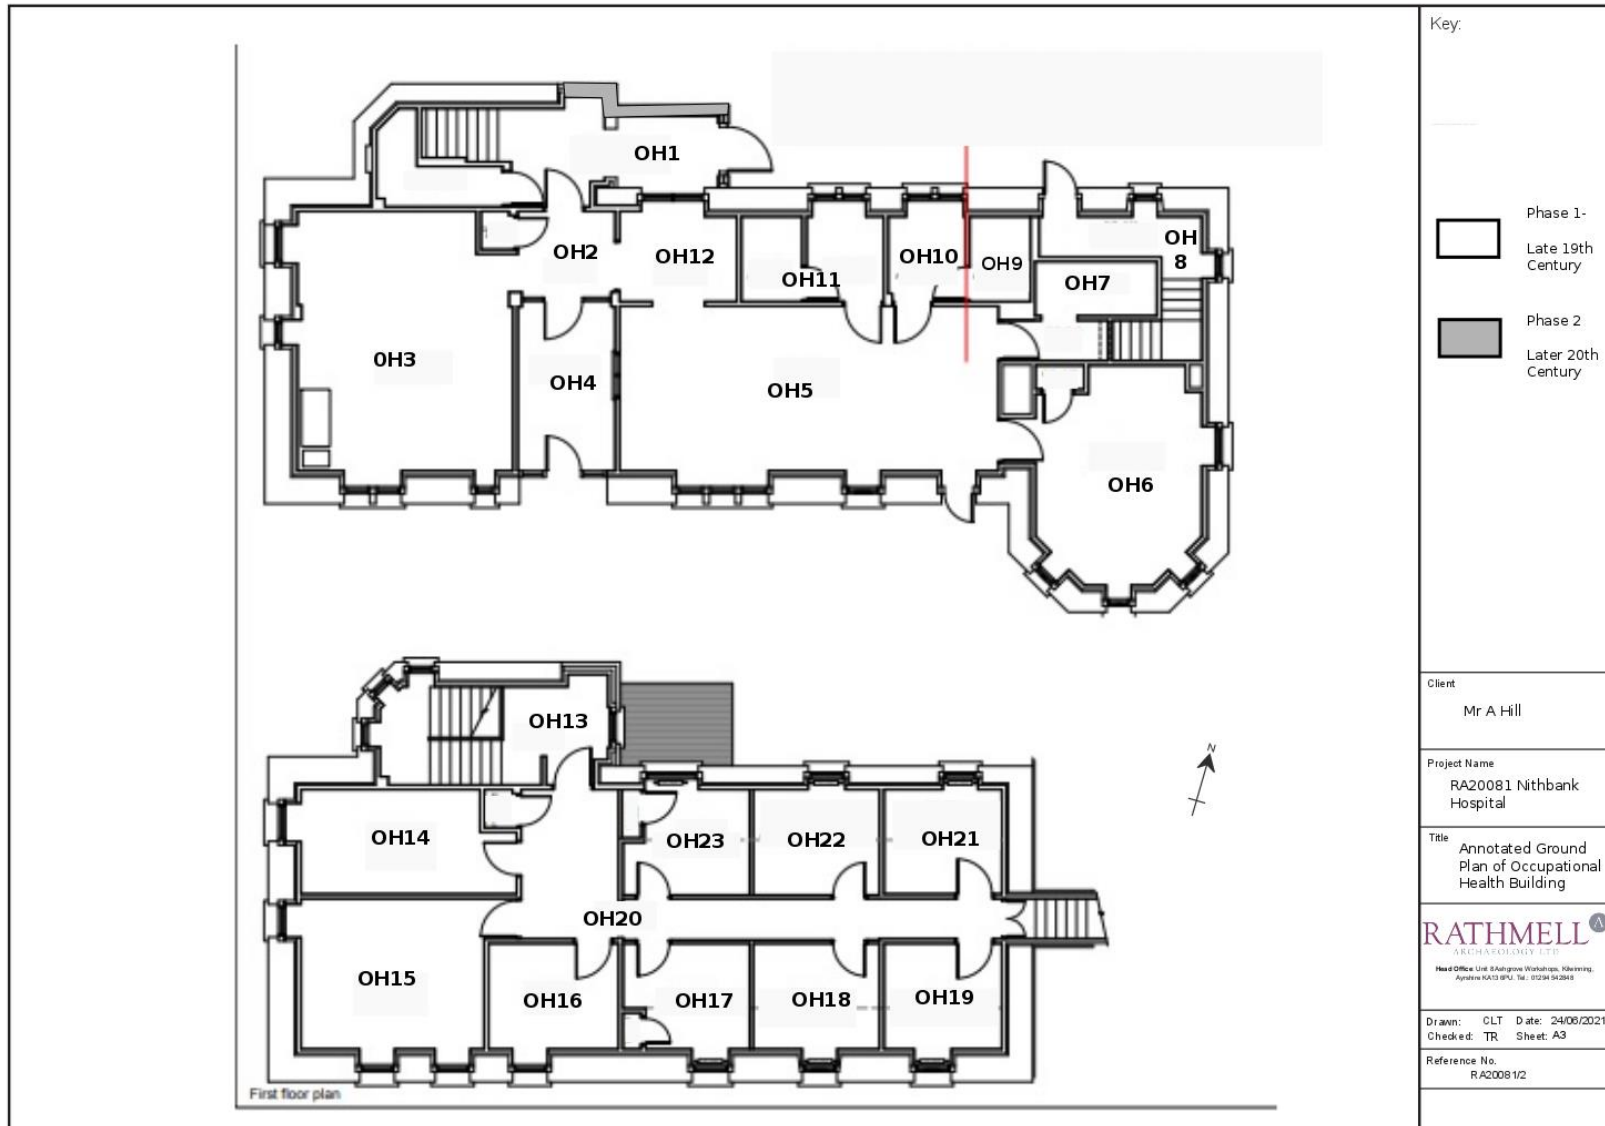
Plan of Occupational Health Building (Former Mortuary)
